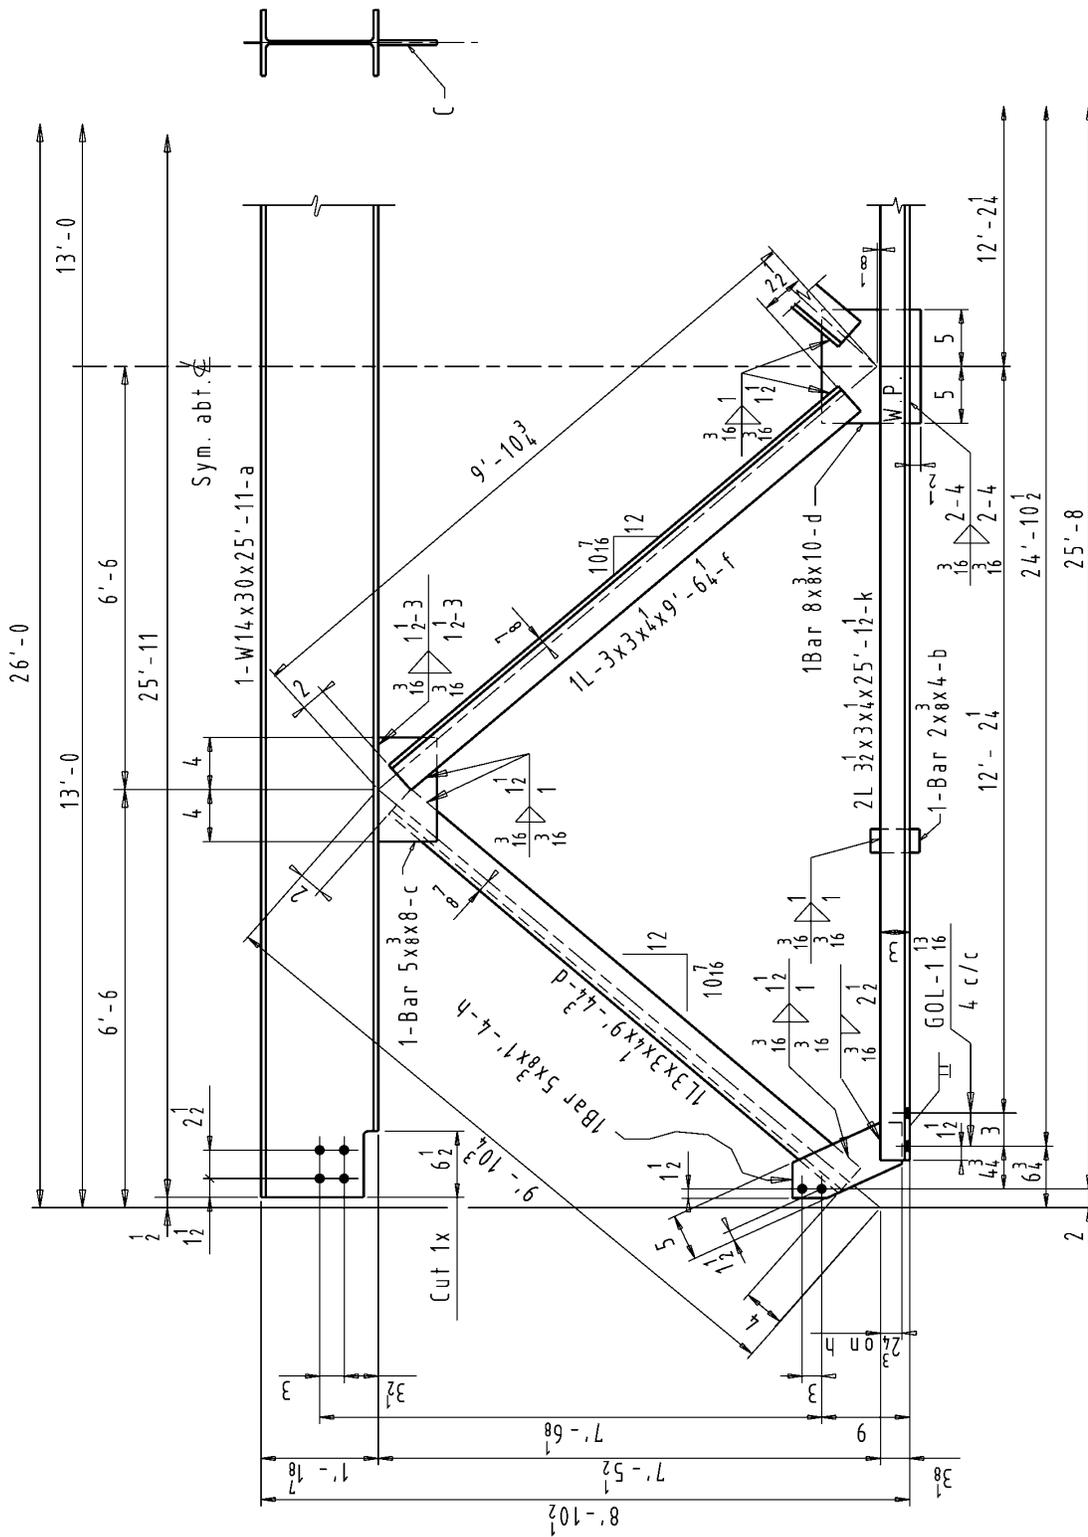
Information that will be used to prepare shop drawings for the trusses and columns.
